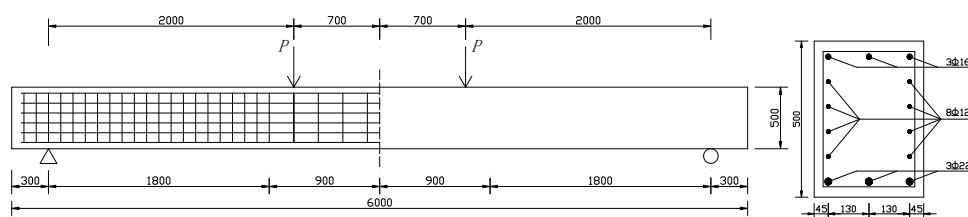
Dimension and section reinforcement drawing of test beam(mm)
